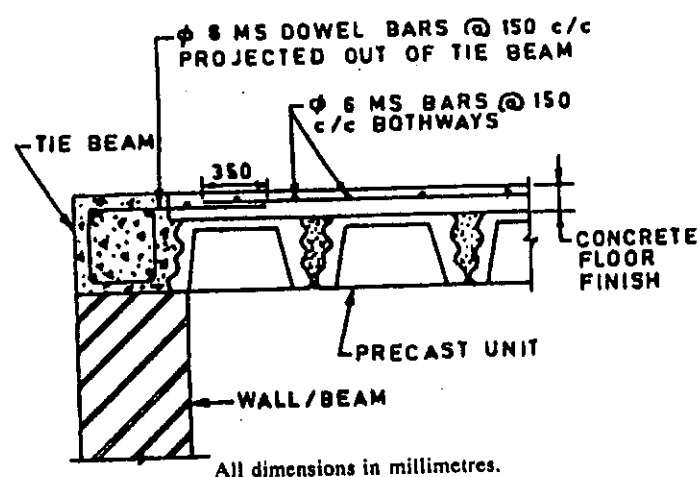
CONNECTION OF PRECAST WAFFLE UNIT FLOOR/ROOF (WITH DECK CONCRETE) WITH TIE BEAM
